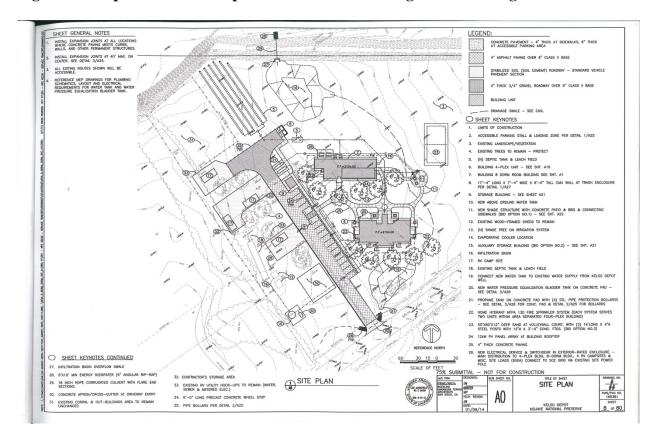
Proposed Site Development Plan at the Existing Kelso Housing Area
